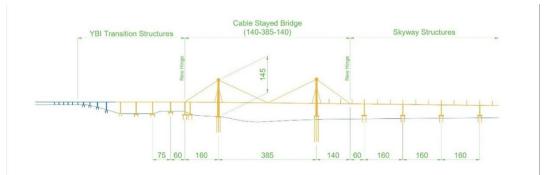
5th proposed variant of the Oakland Bay Bridge.
